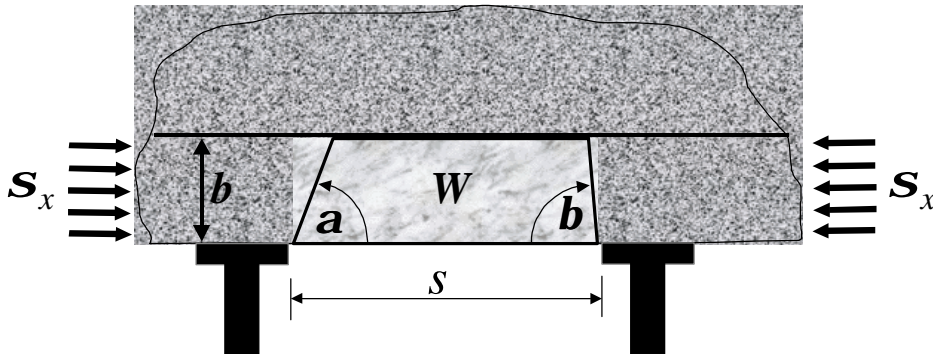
Potential keyblock instability due to shear failure at the abutments.
